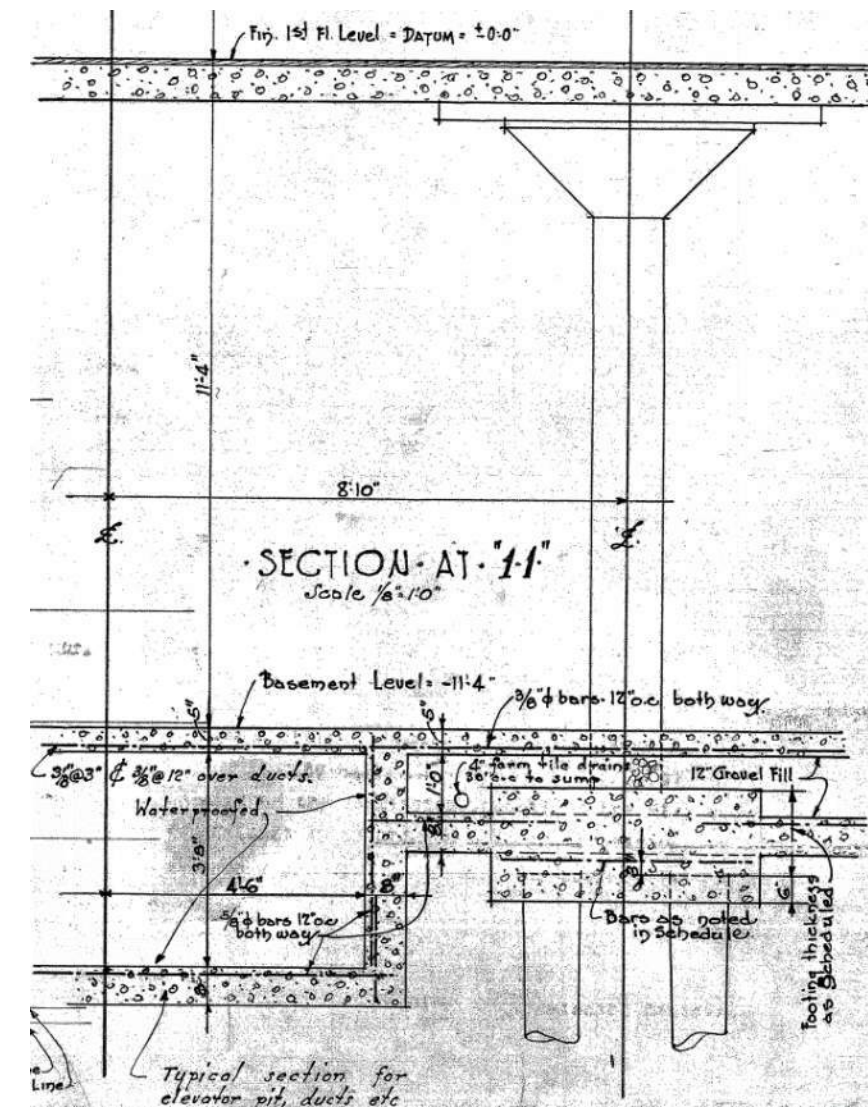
CROSS SECTION SHOWING DOUBLE BASEMENT SLAB, DRAINAGE LAYER AND TWO-WAY FLOOR SLAB ABOVE
